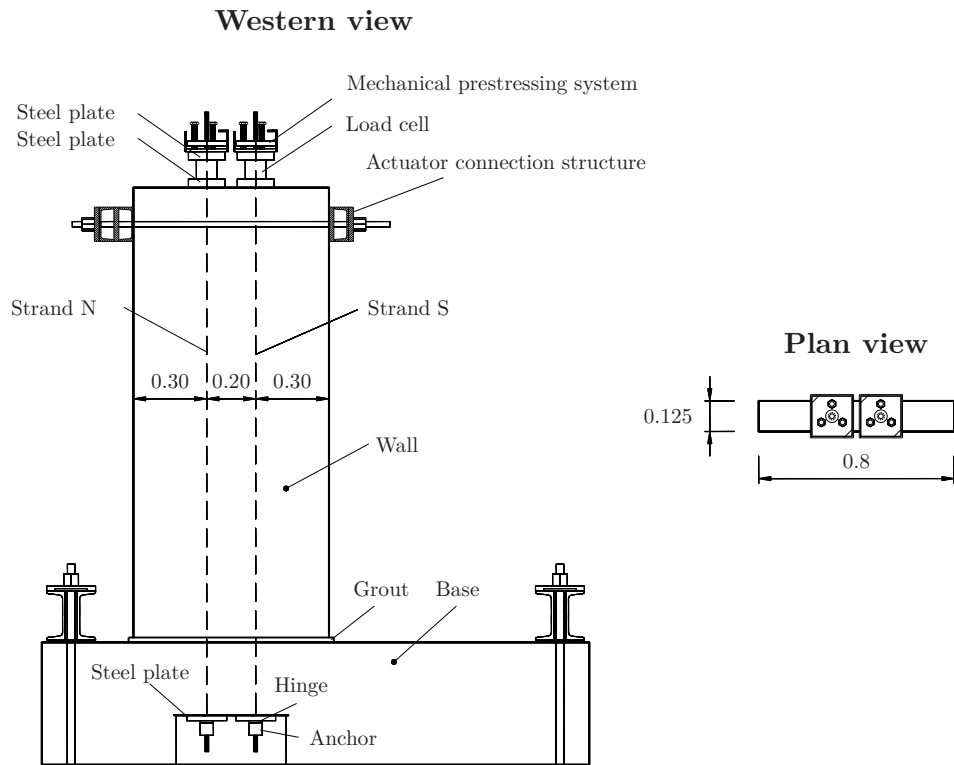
Western and plan views of wall specimen RM2 test setup.
